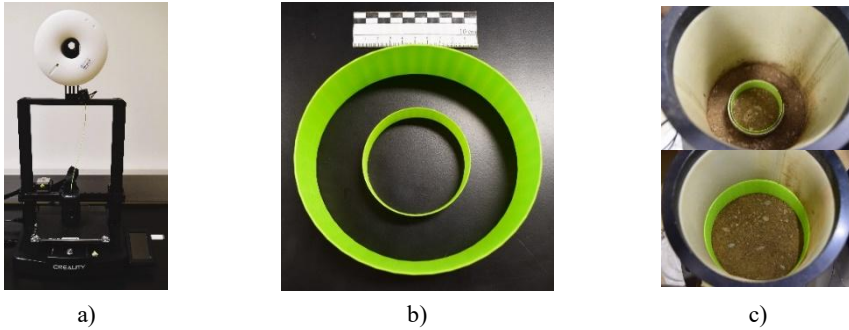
Prototyping of geocells: a) 3D printer; b) 3D printed geocells GC075 and GC150; c) geocells inside the triaxial specimens.
